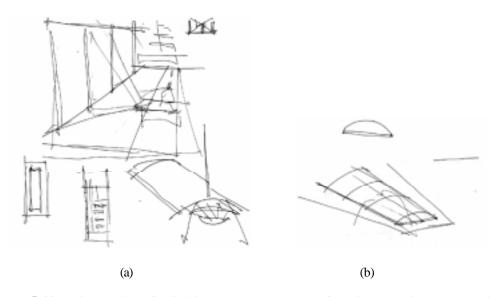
Noi's drawings for lighting concerns: (a) top (left to right): sectional perspective, thumbnail section, bottom: ceiling plans, lighting fixture. (b) skylight perspective drawn from a dome section
